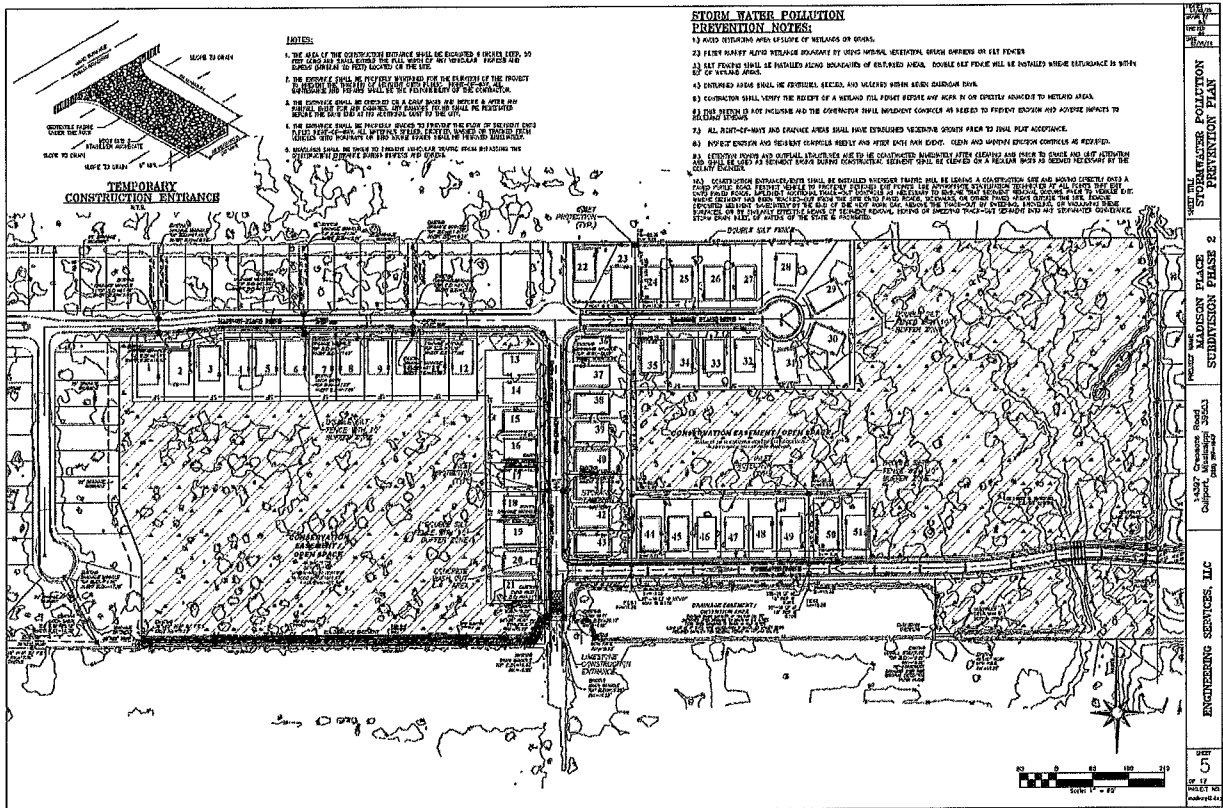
Madison Place 2 Stormwater Pollution Prevention Plan Exhibit submitted to the City as part of the preliminary plat agenda packet.
